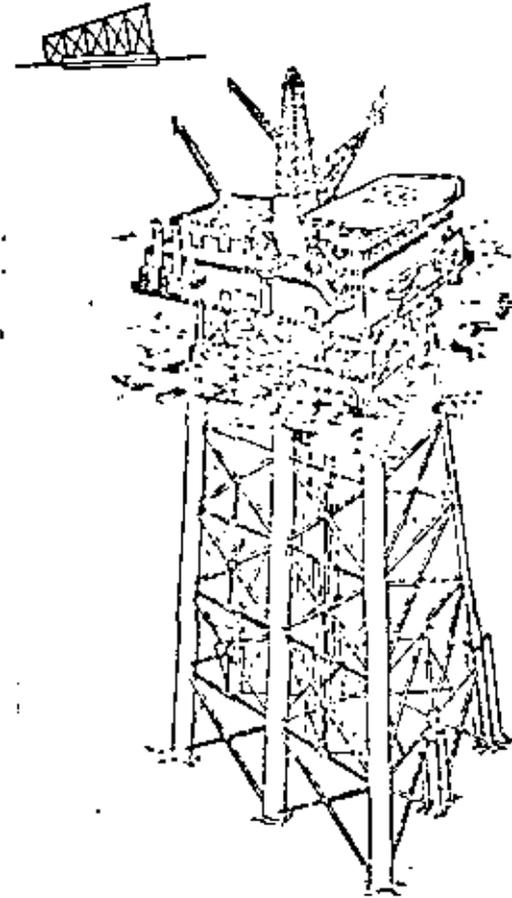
Hybrid tower with inbuilt buoyancy.
